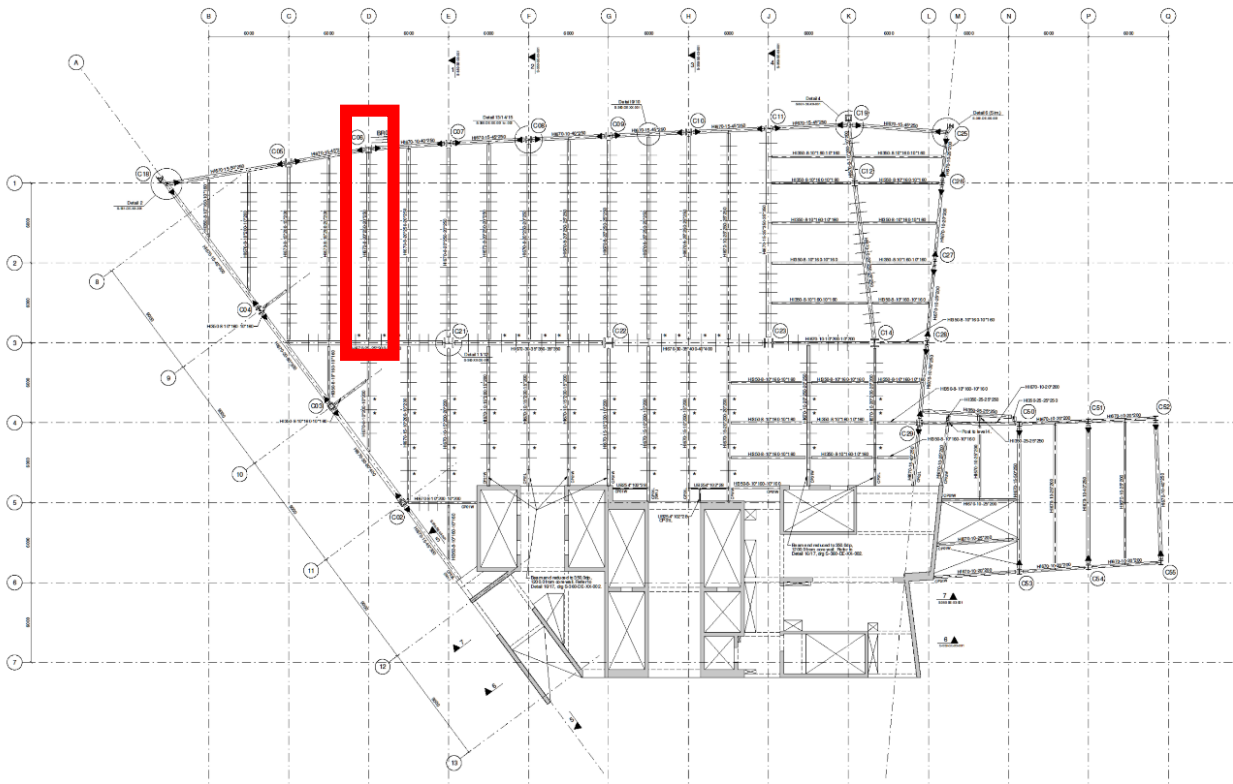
2: Floor plan of the scalpel, with the area used for the analysis highlighted in red (preliminary plans provided by ARUP UK, used with permission and not representative of the final design).
